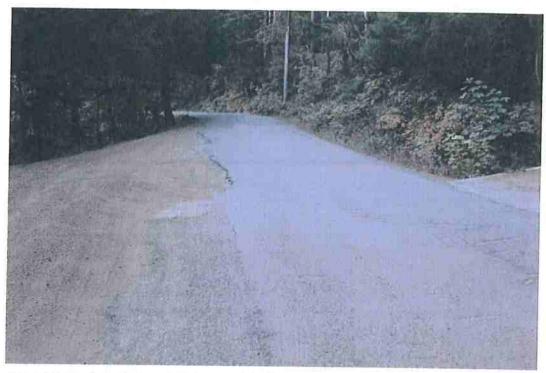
Mile 2.3: 20-ft road width with 2-ft shoulders.
